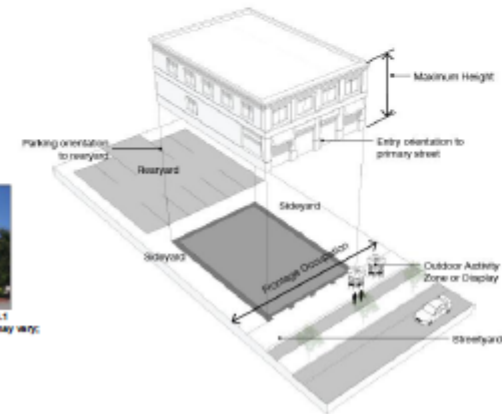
BUILDING AND SITE TYPES
